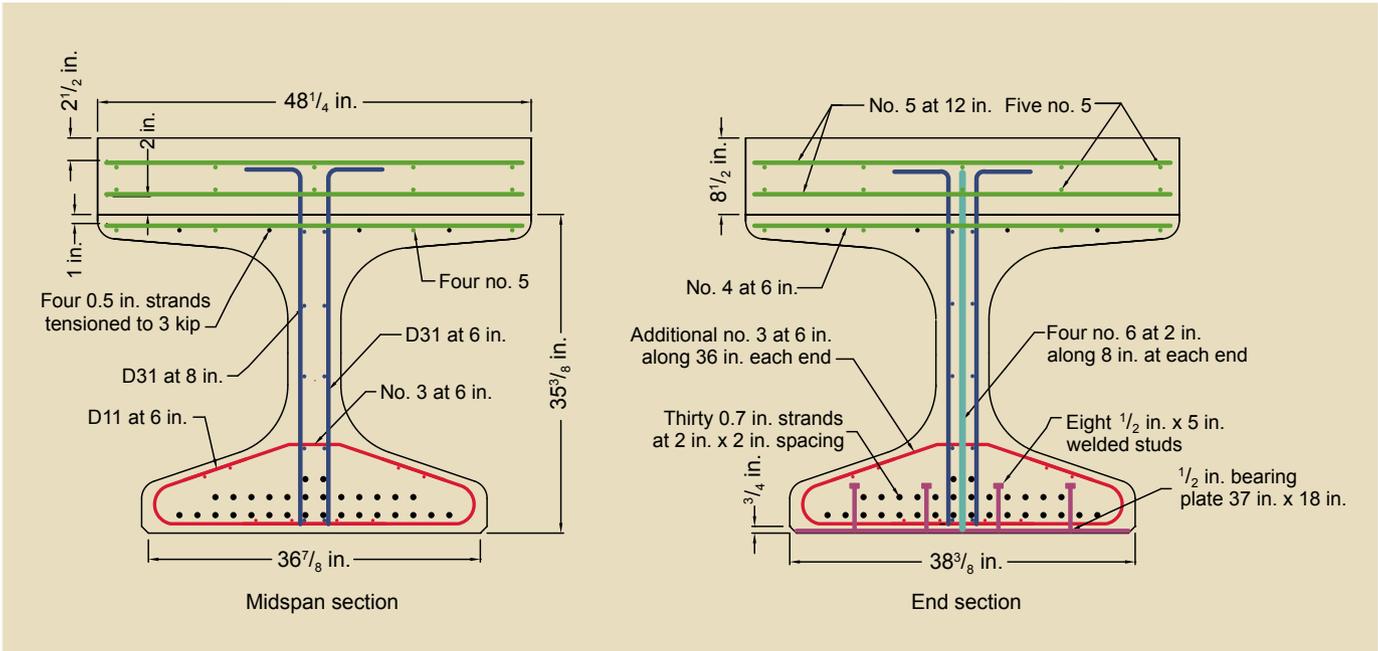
Girder B sections and reinforcing details. Note: no. 3 = 10M; no. 4 = 13M; no. 5 = 16M; no. 6 = 19M; 1 in. = 25.4 mm; 1 kip = 4.448 kN.
